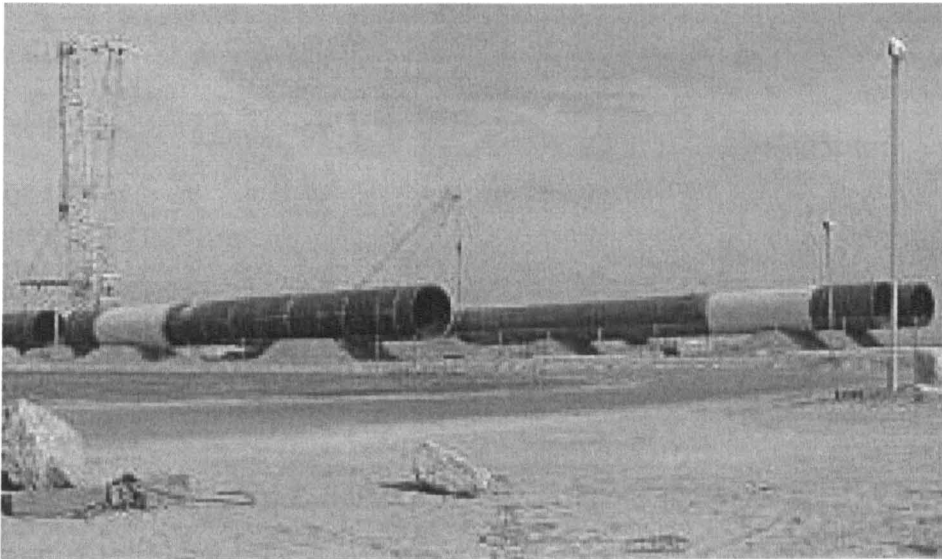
Monopile foundations for offshore wind used in North Hoyle
